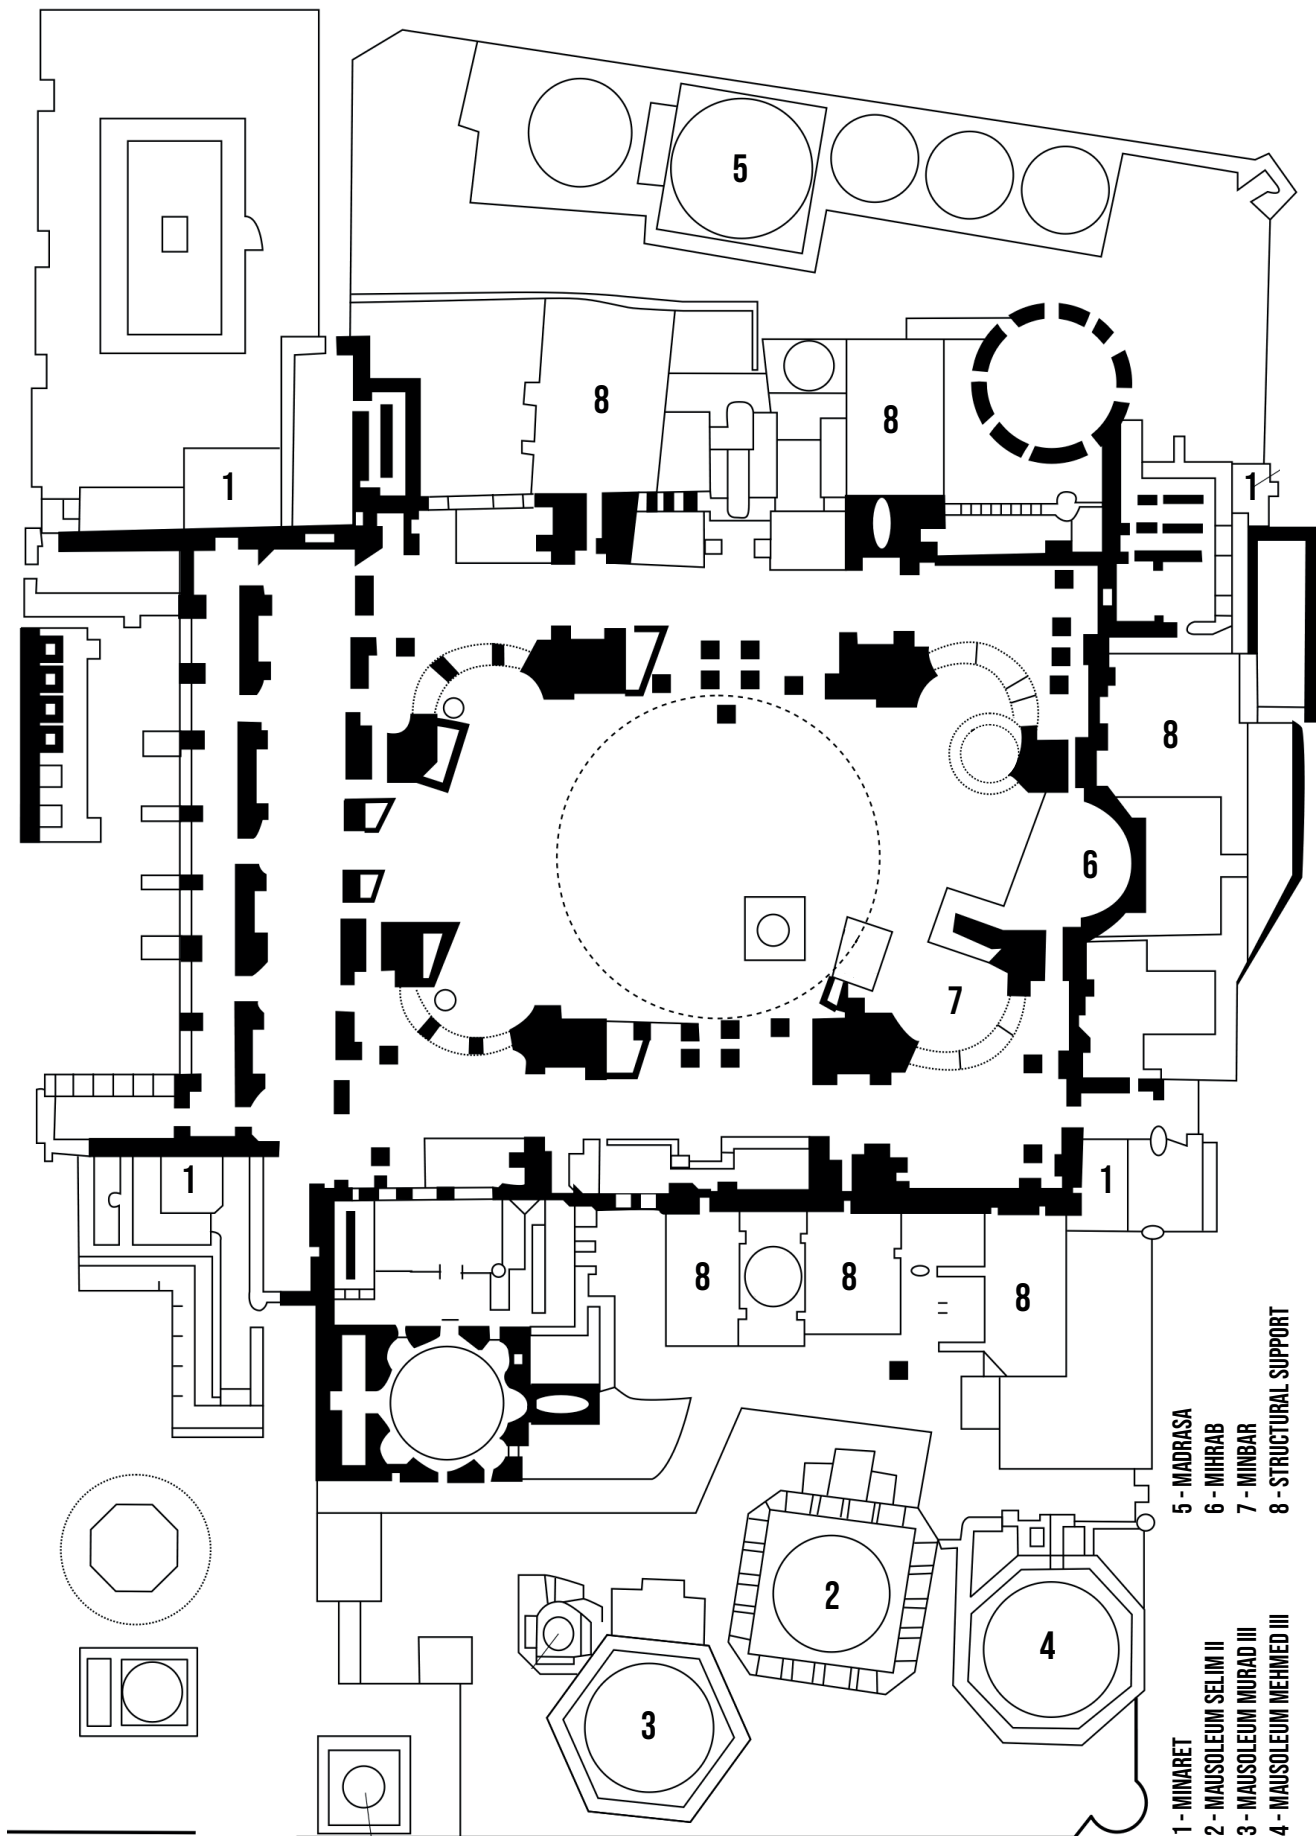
Plan Hagia Sophia renovations and additions (Aya Sophia Floor Plan, z.d.)
